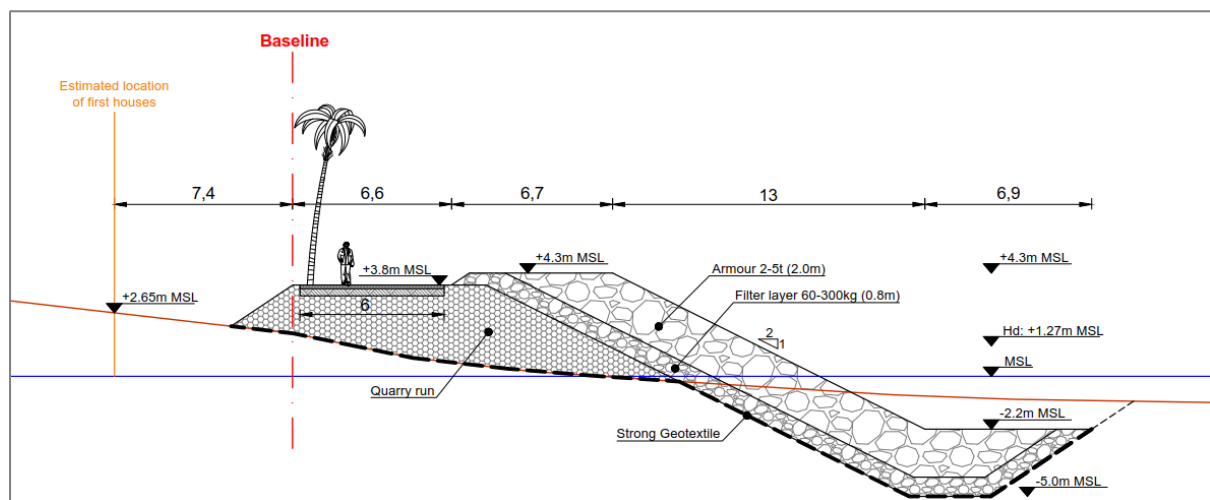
Typical cross-section of the proposed revetment at West Point.
